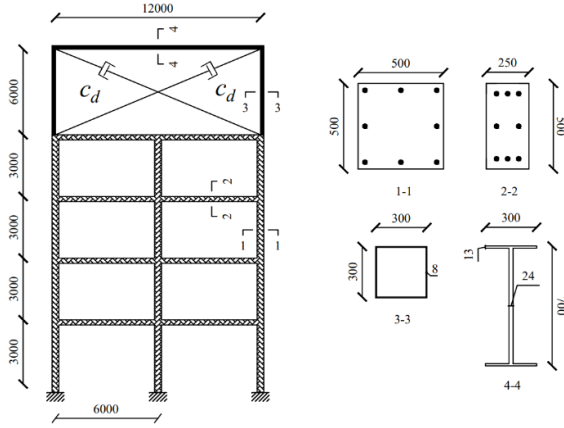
An office building with mixed steel-concrete structure (unit: mm)
